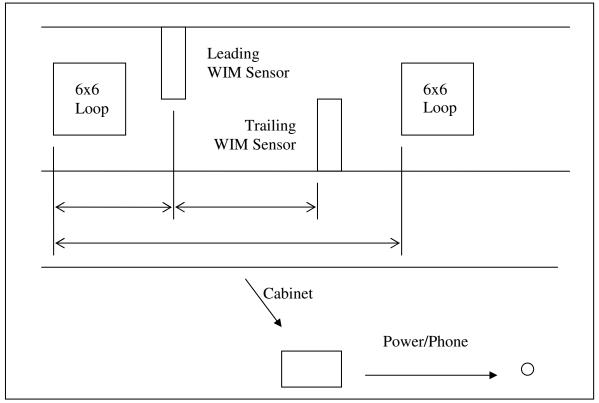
Site Equipment Layout for 510100 in Virginia
